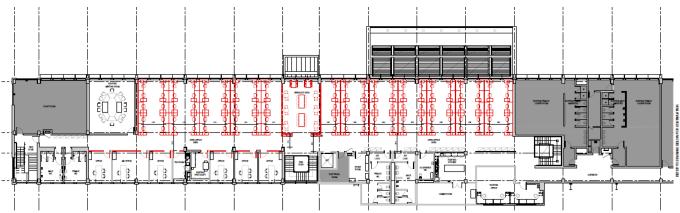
Extract from Architectural Plan - Proposed First Floor Plan
